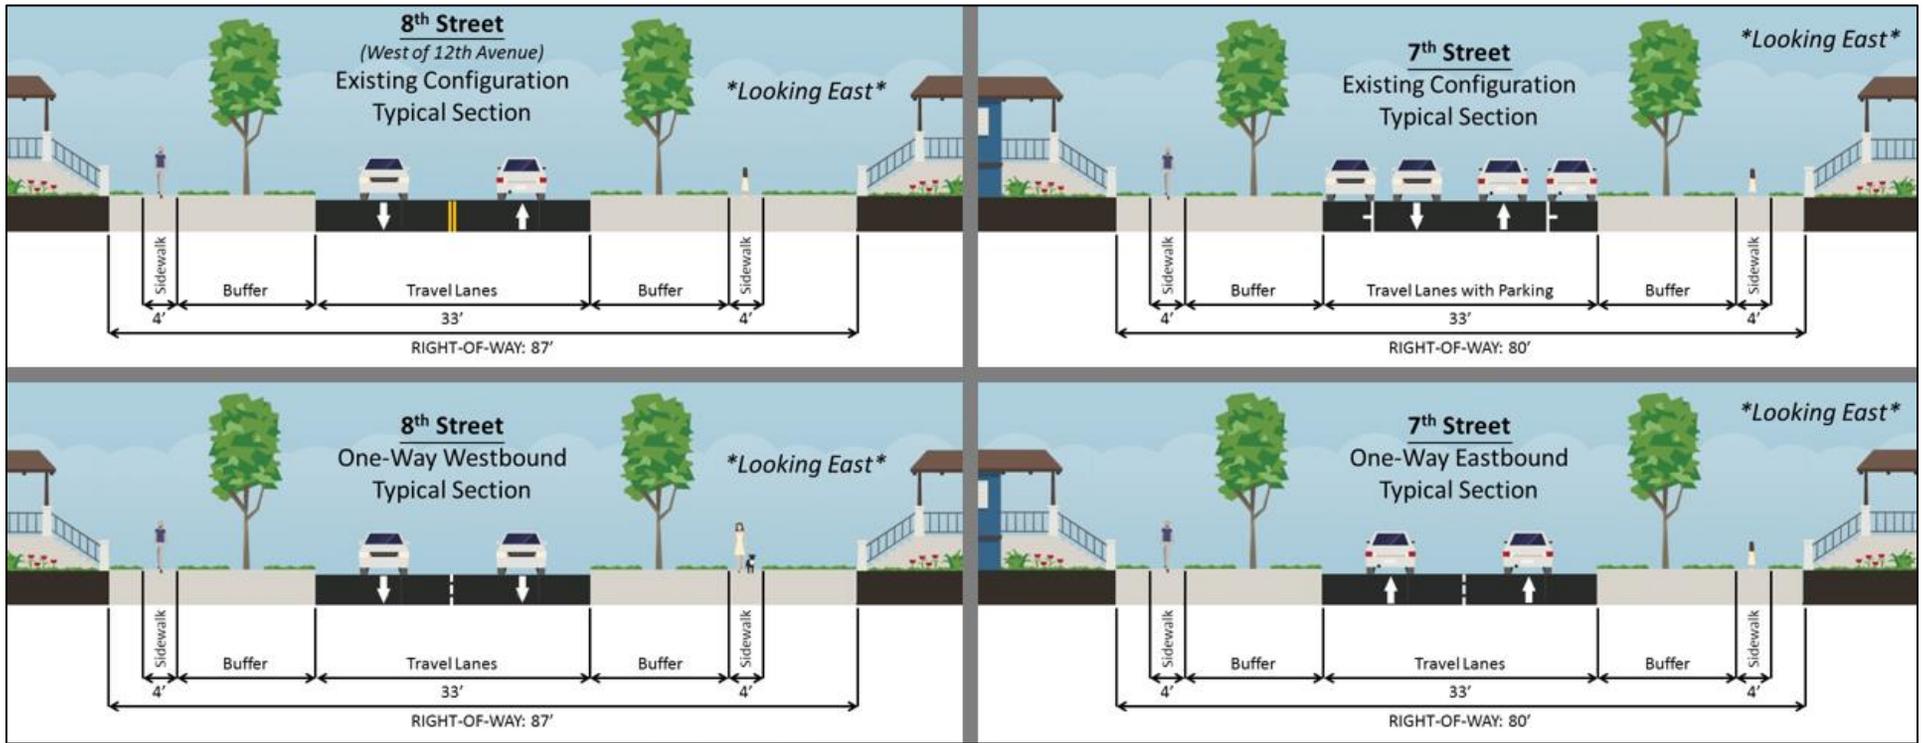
Alternative 3B – Typical Sections along 7th Street and 8th Street
